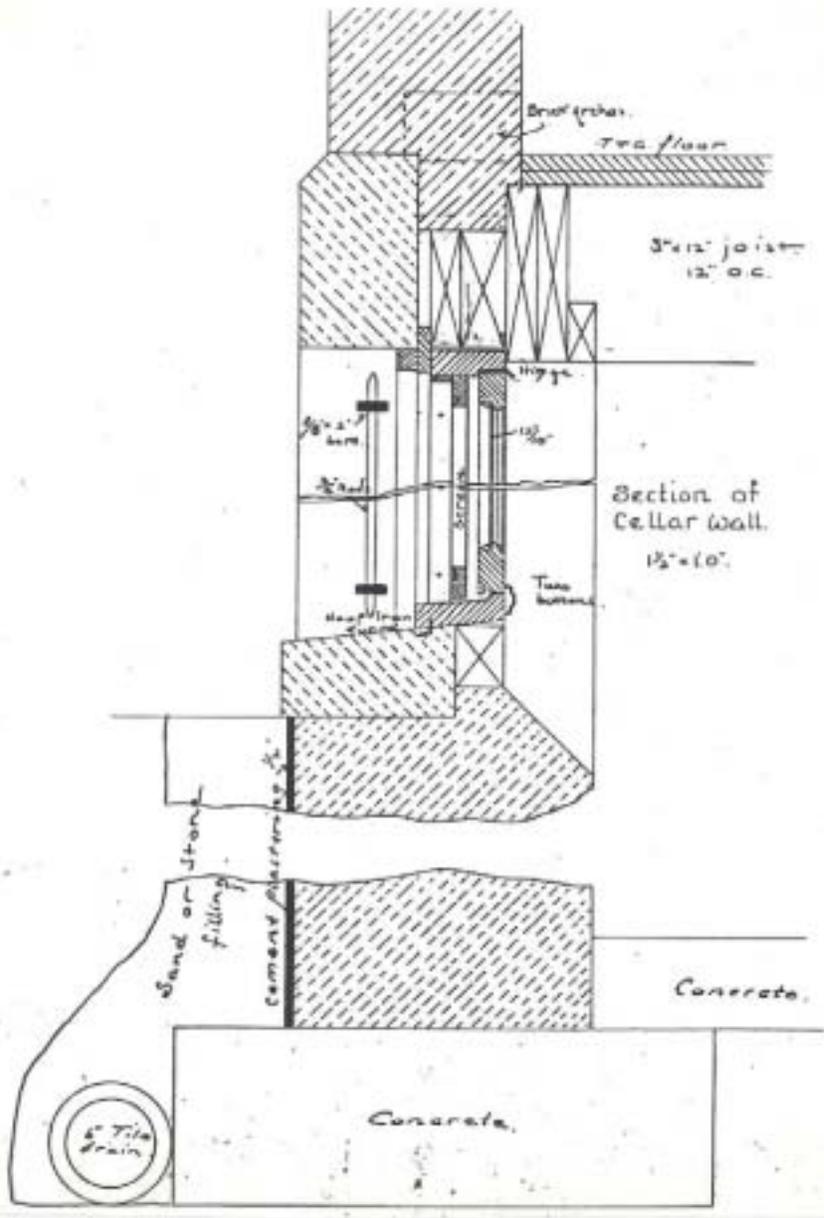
Section of basement window, as designed in original 1894 drawings and constructed in 1898.
